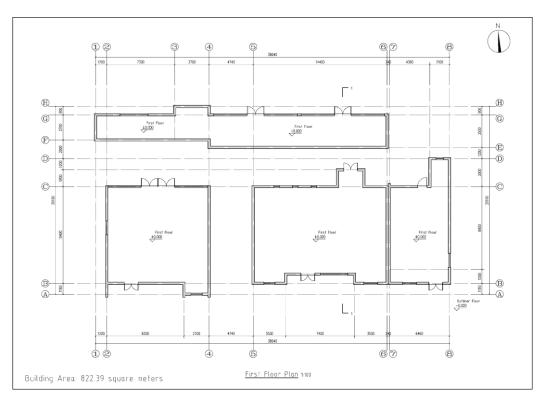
The First Floor Plan of Building Complex (Drawn by the author)
